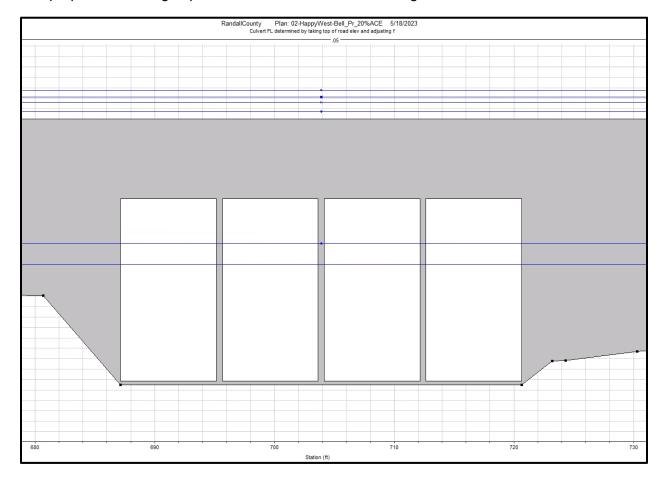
Proposed 20% LOS upstream cross section at Happy West Road crossing of Happy Draw.
